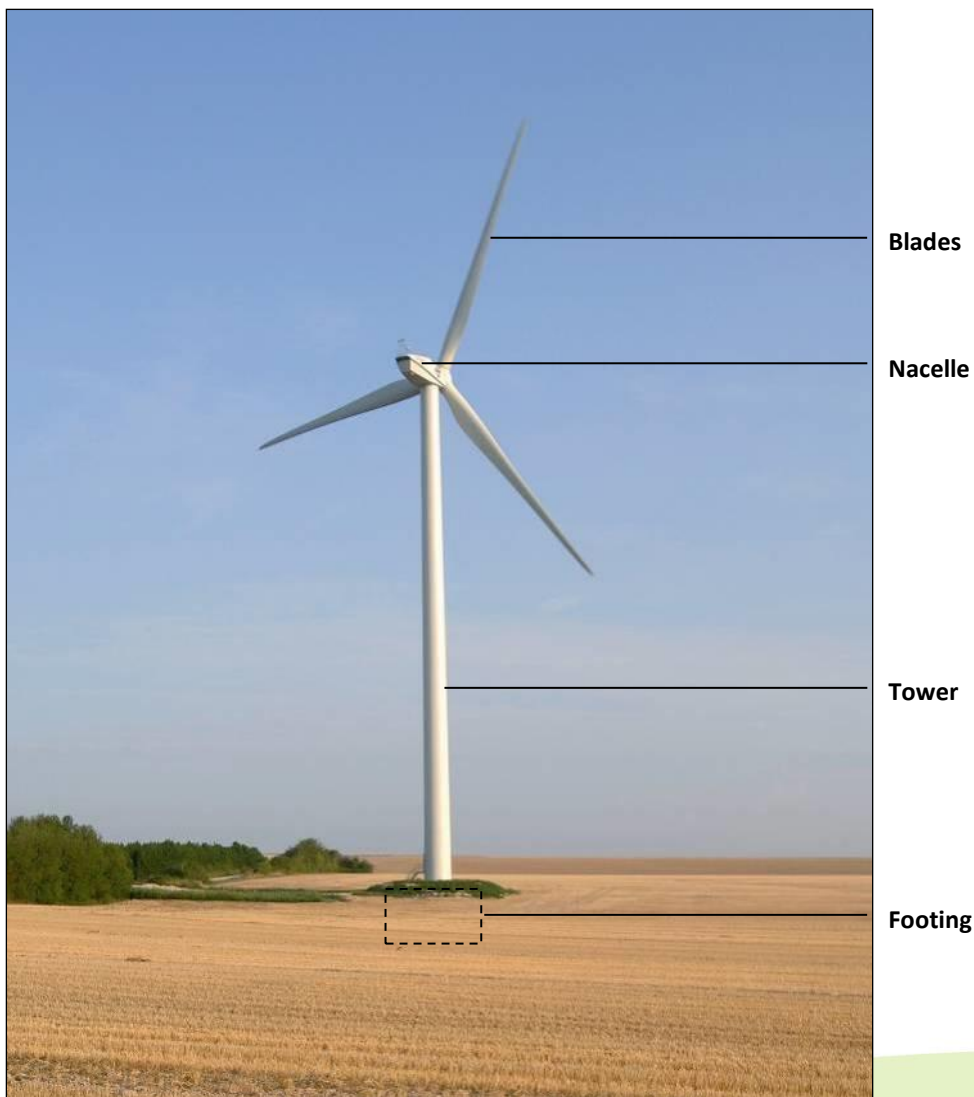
Typical wind turbine installed on an 80m tower (Photo courtesy REpower Systems AG)
